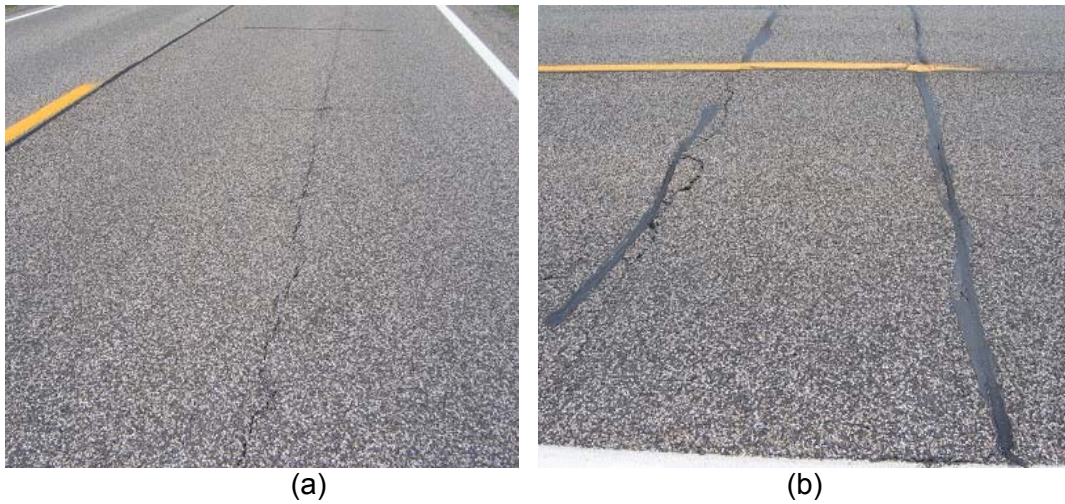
Typical cracks: (a) longitudinal crack and (b) joint-associated sealed reflective cracking.
